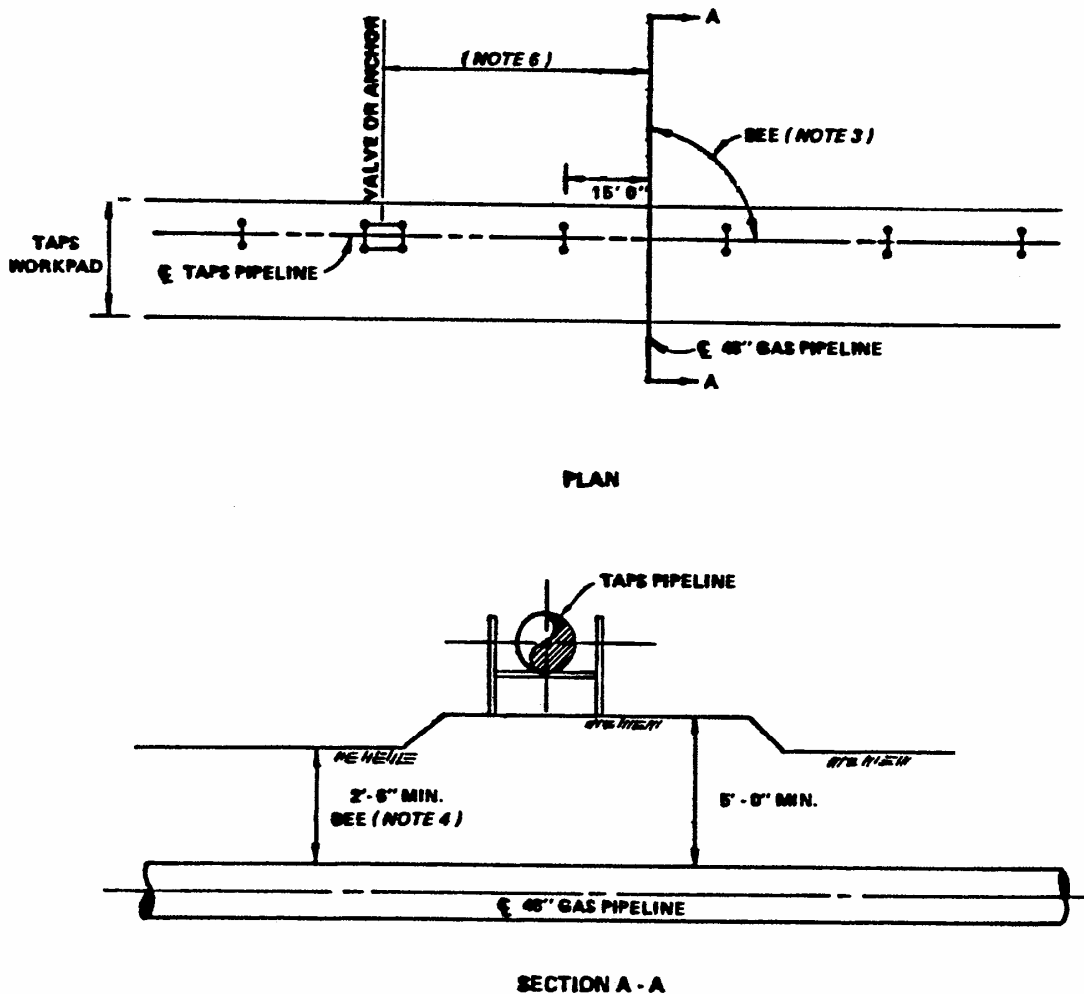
Typical Crossing TAPS Pipeline Aboveground
